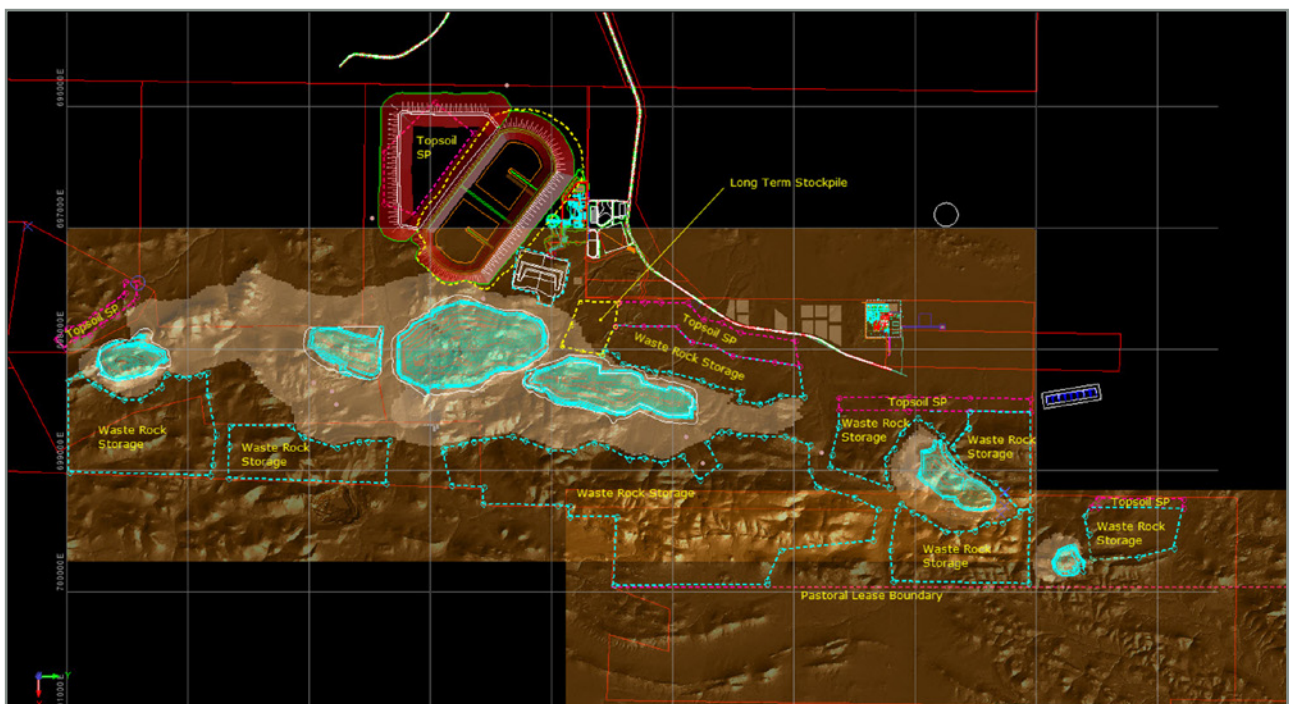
OPEN PITS, WASTE DUMPS, TOPSOIL STOCKPILES AND SITE LAYOUT
